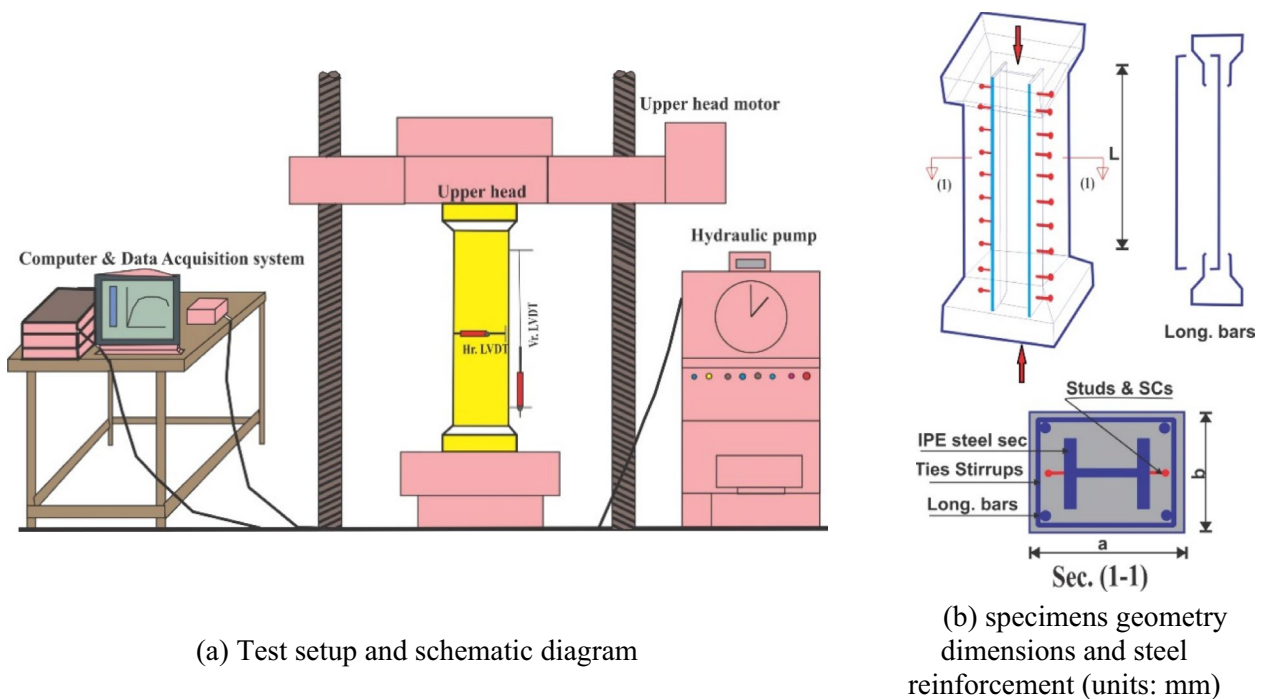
Test setup and specimens' details: (a) Test setup and schematic diagram; (b) specimens geometry dimensions and steel reinforcement (units: mm)
